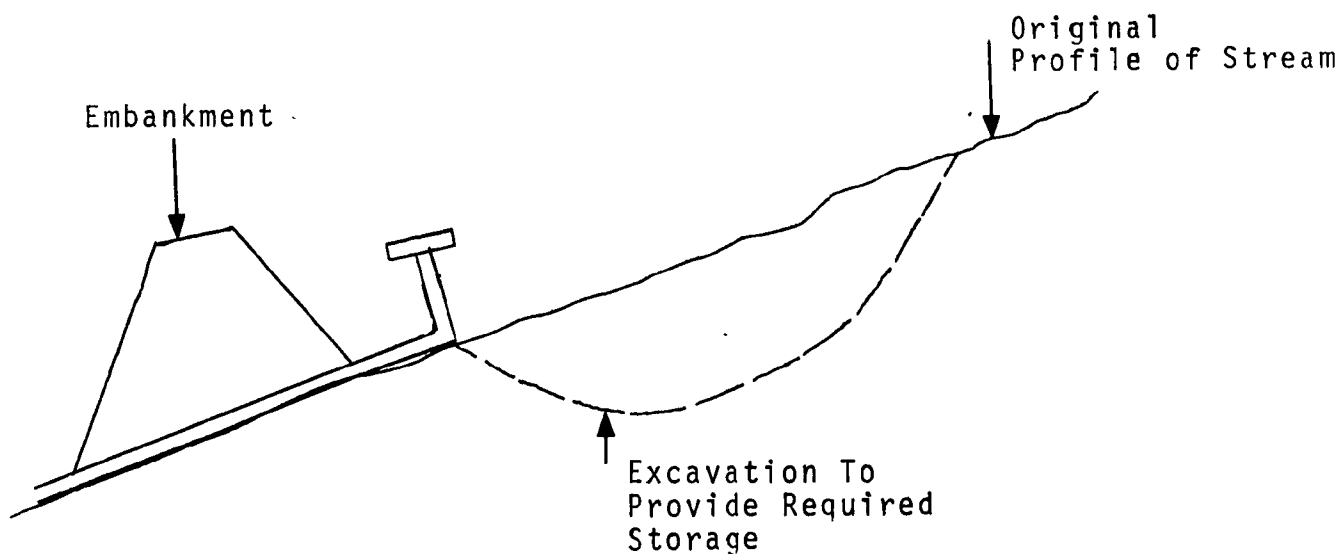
Profile View of Stream Excavation for Sediment Storage
